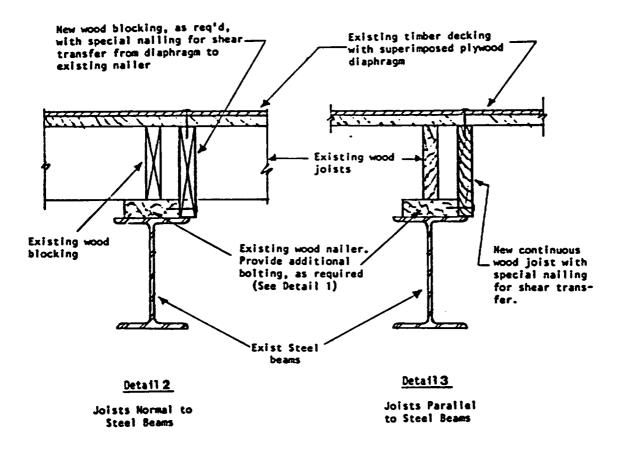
Strengthening of existing wood diaphragms in steel frame buildings
